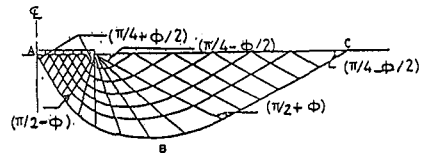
Typical assumed failure surface ABC for footing.
